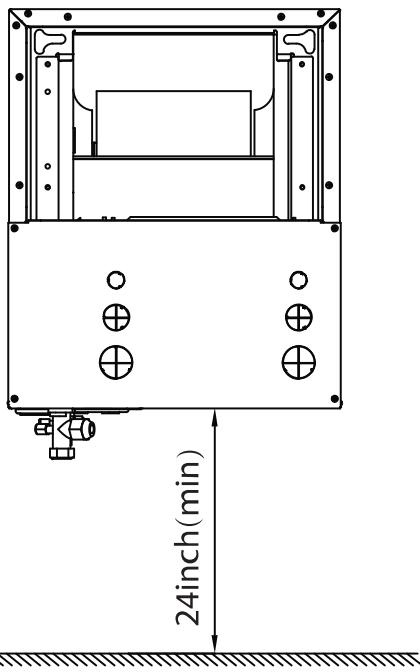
Dimensions 18K – 60K, (in.)mm
